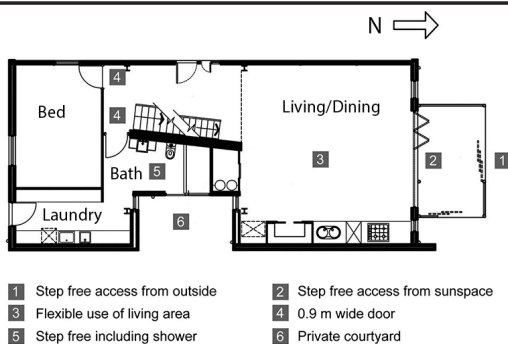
Hamersley Road ground floor plan showing the ‘tangible’ elements of design
